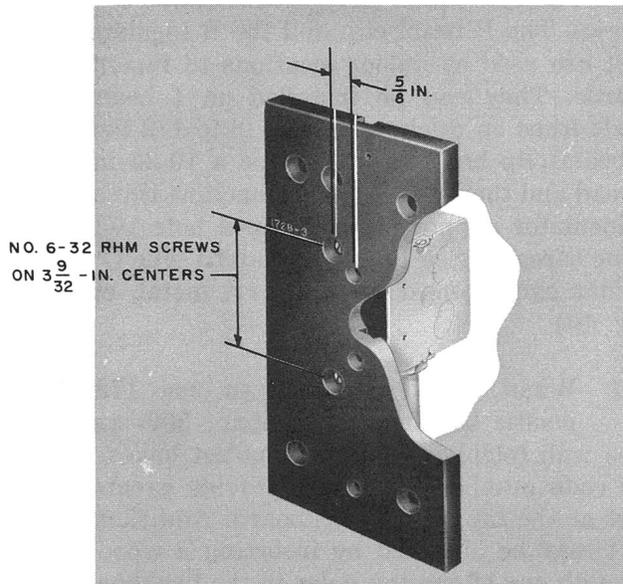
172-Type Backboard Mounted over Telephone Outlet Box
